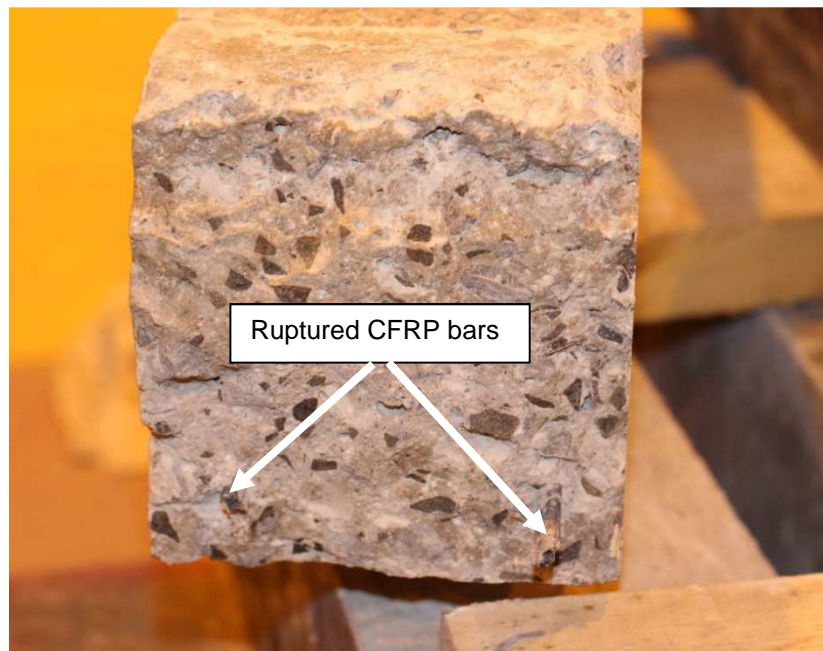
FRP reinforcement rupture in beam with continuous reinforcement (D2).
